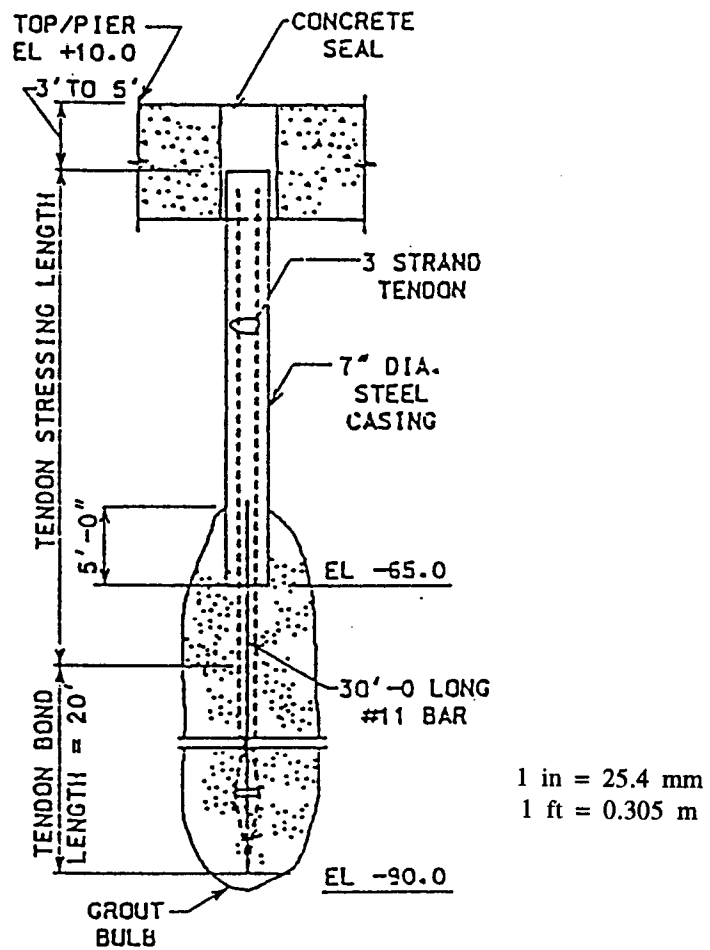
Typical detail of micropile, Pocomoke River Bridge, Maryland (Bruce et al., 1990).
